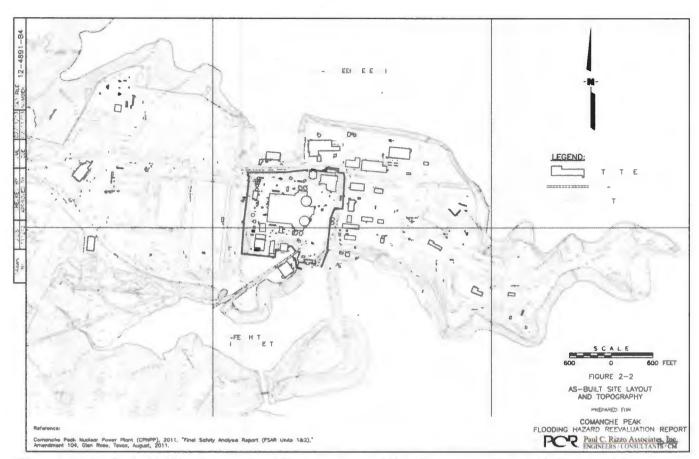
As-built Site Layout and Topography of the Comanche Peak, Units 1 and 2 Site (adapted from FHRR Figure 2-2)
